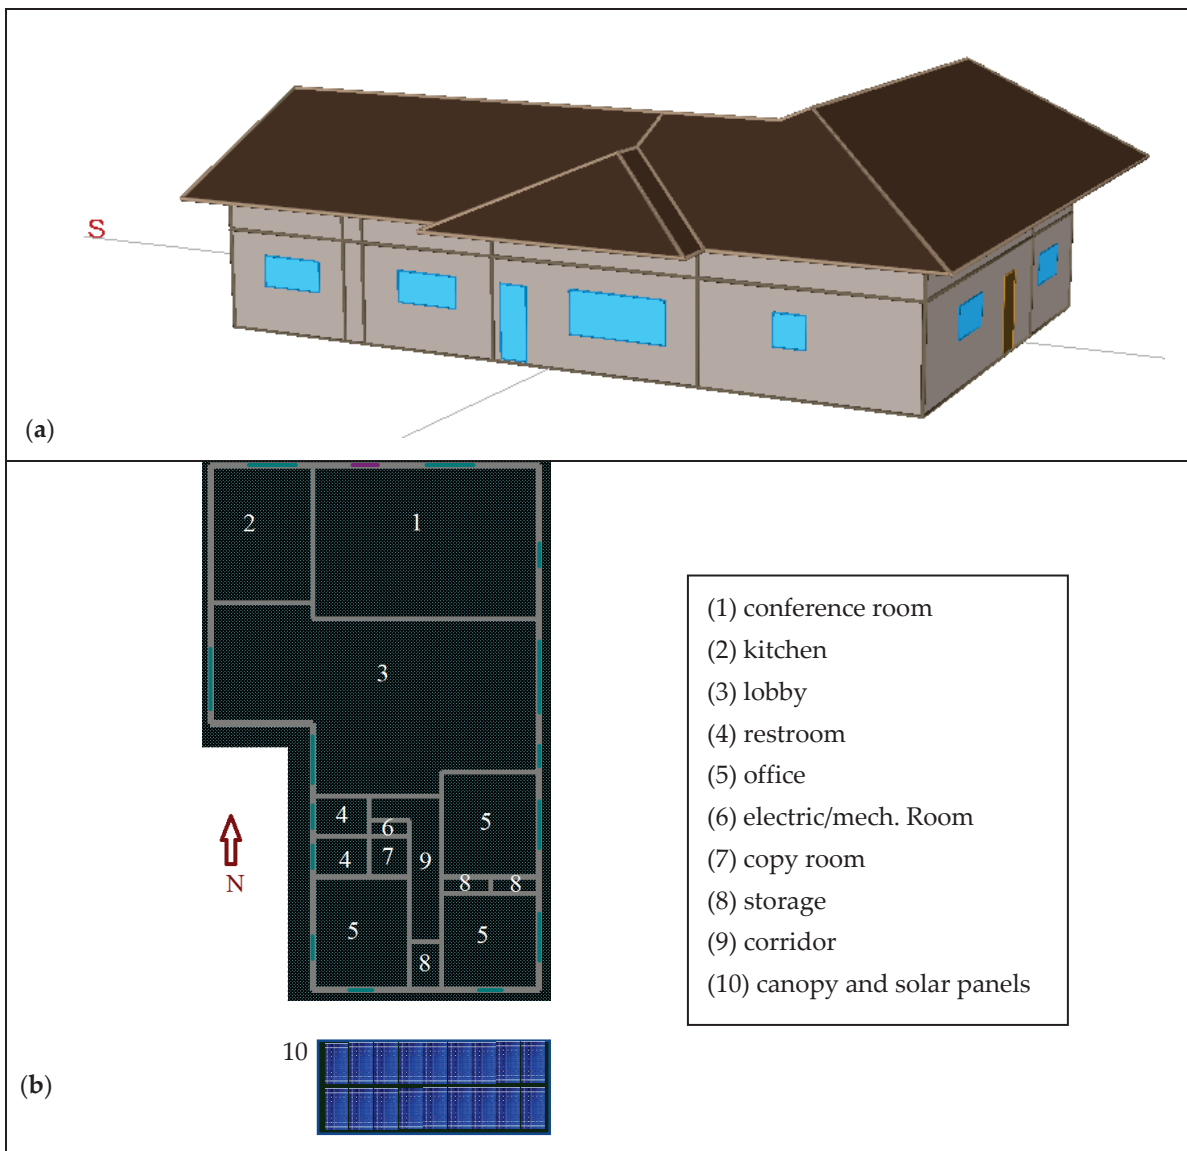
(a) 3D building model developed in eQuest; (b) building layout.
